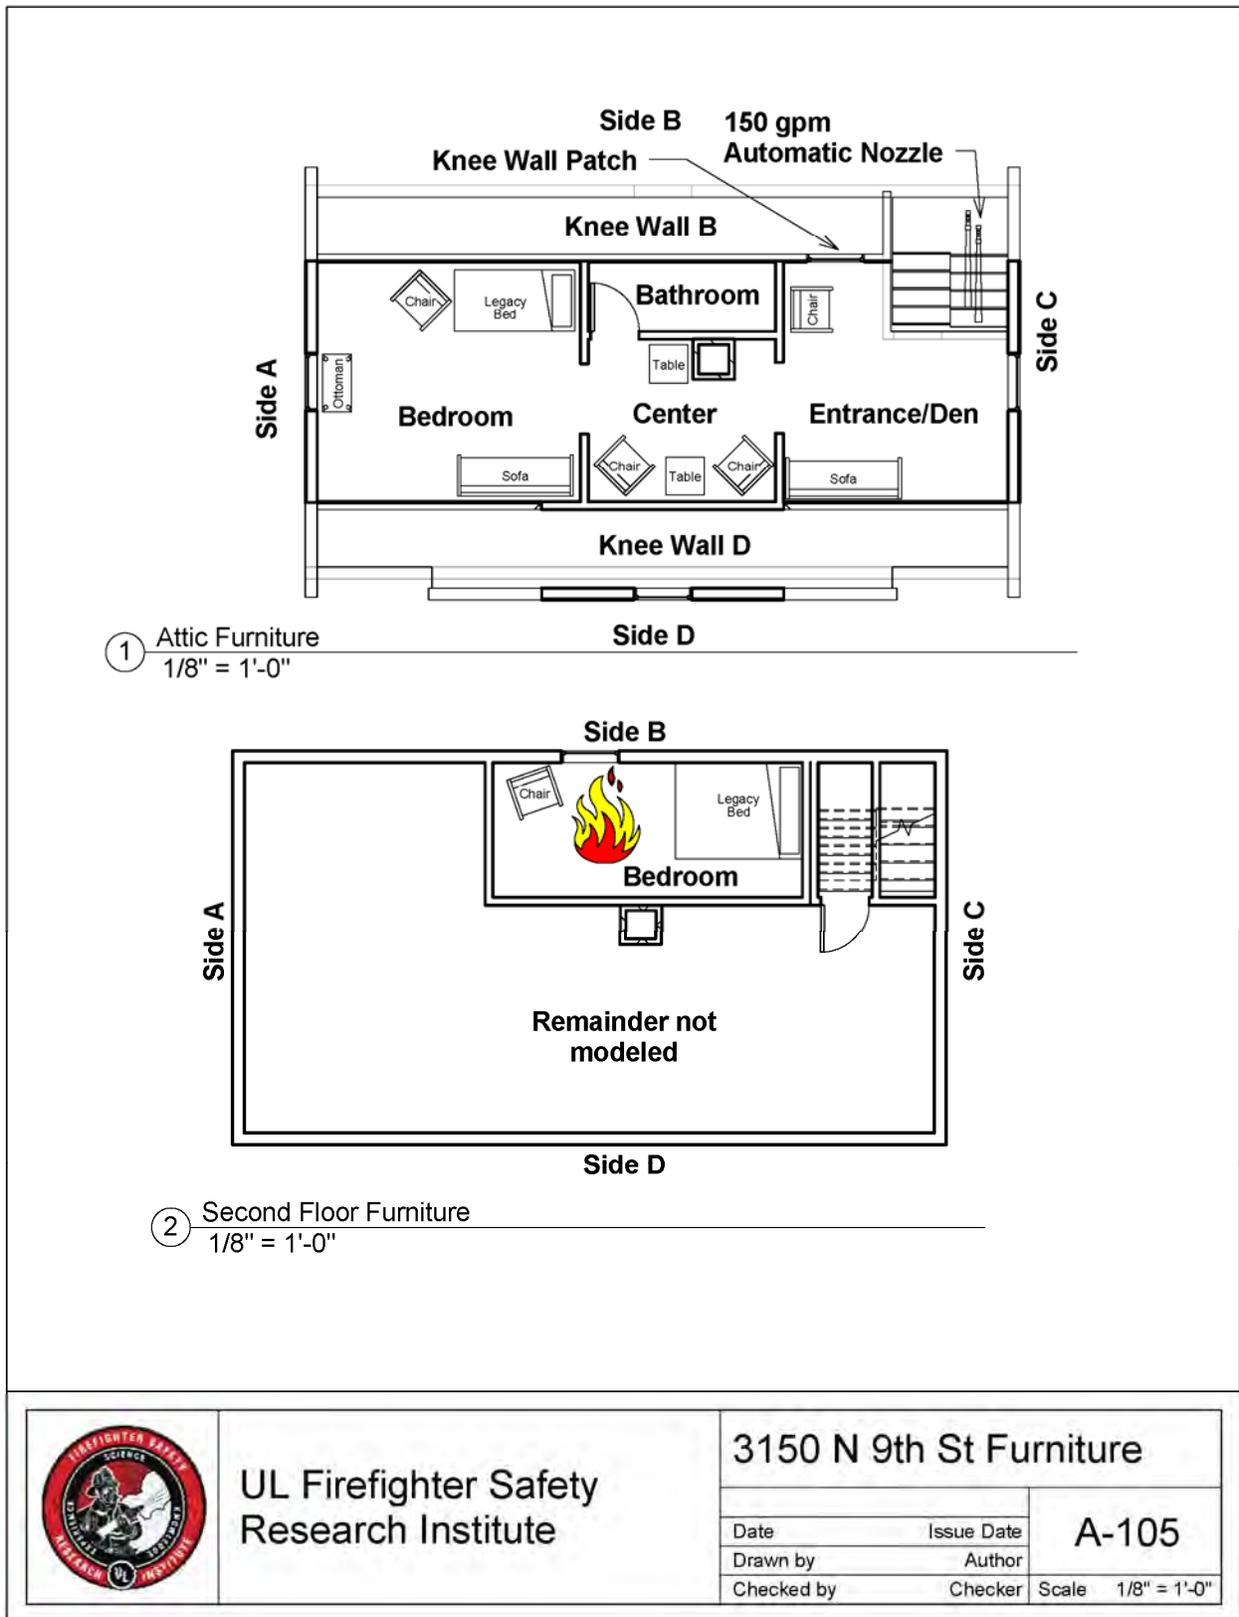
Experiment 1 – 3150 Nth 9th Street Furniture Layout Drawing.
